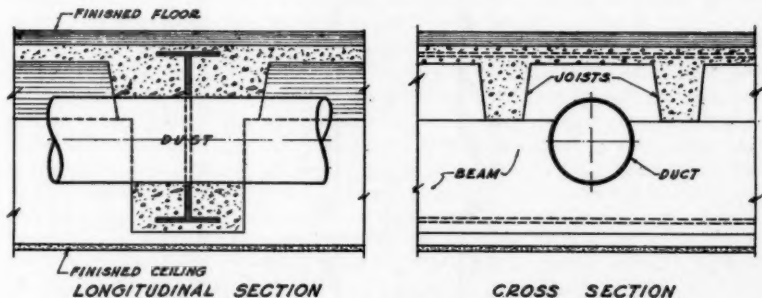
ARRANGEMENT OF DUCTS AND FLOOR CONSTRUCTION
